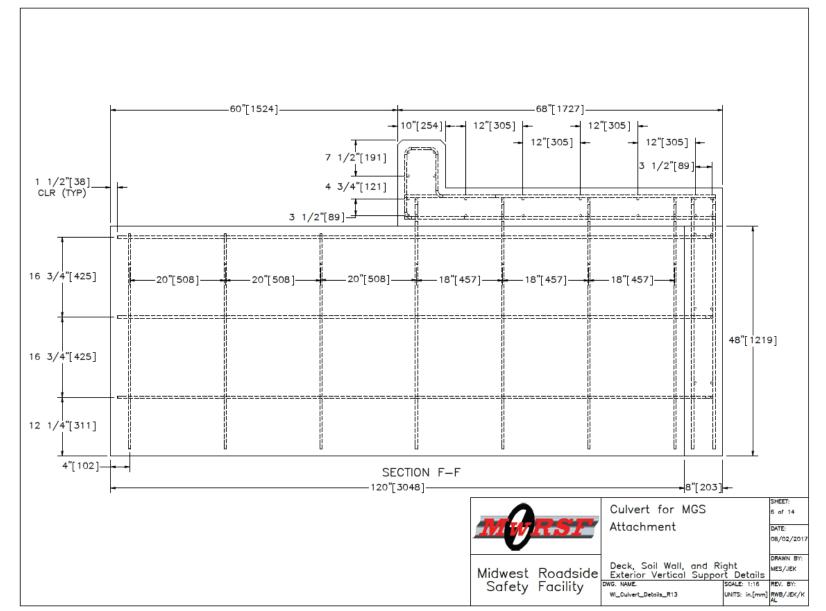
Top Slab, Soil Retaining Wall, Right Exterior Vertical Support Wall Details, Test Nos. CMGS-1 and CMGS-2
